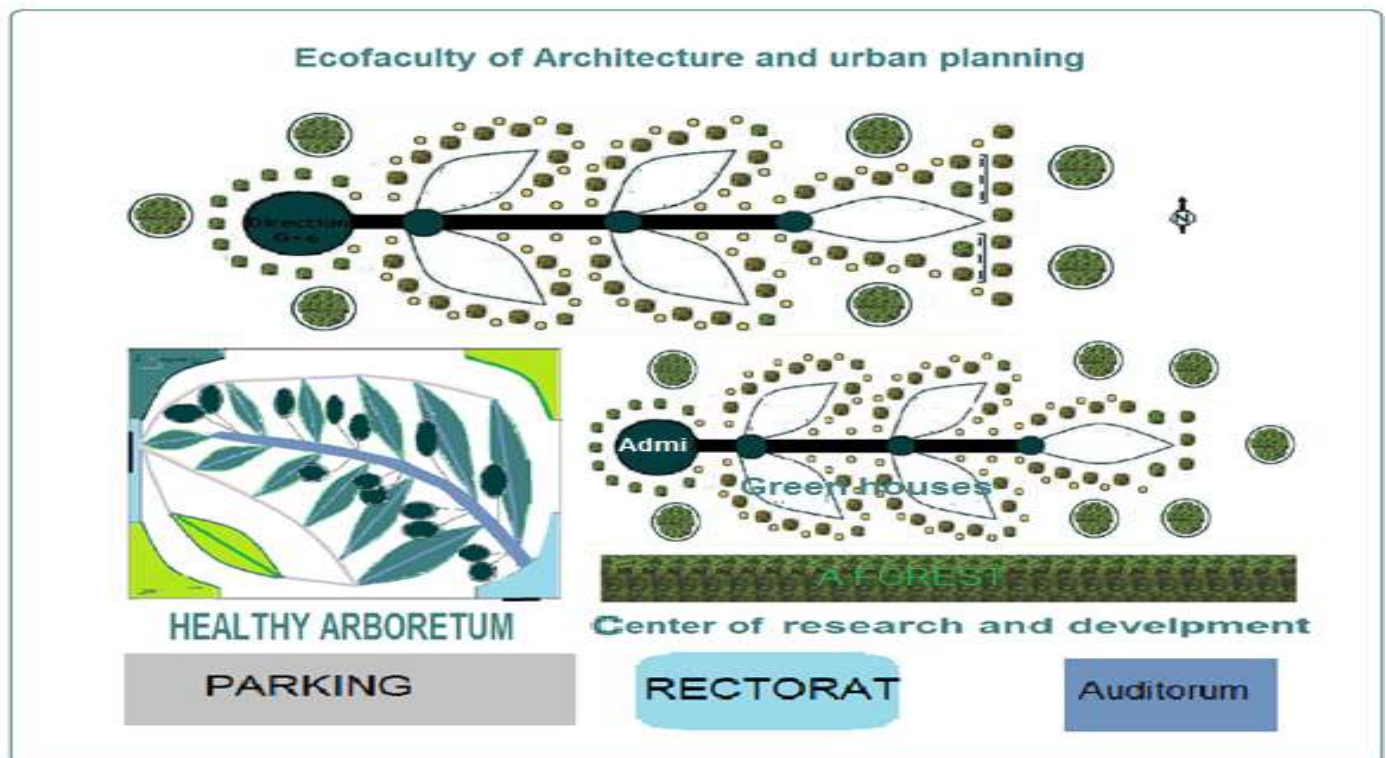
Model in plan on scientific space of architecture and planning(Source.Author.2024)
